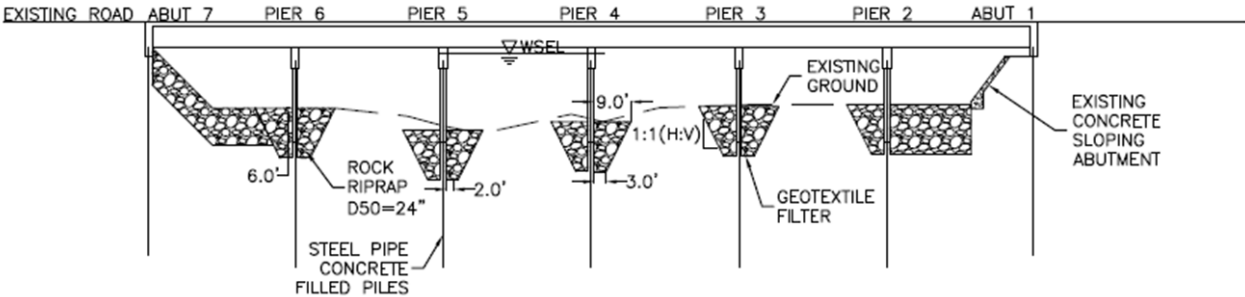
Cross-sectional view of Bridge A-28-N with recommended hydraulic scour countermeasures
